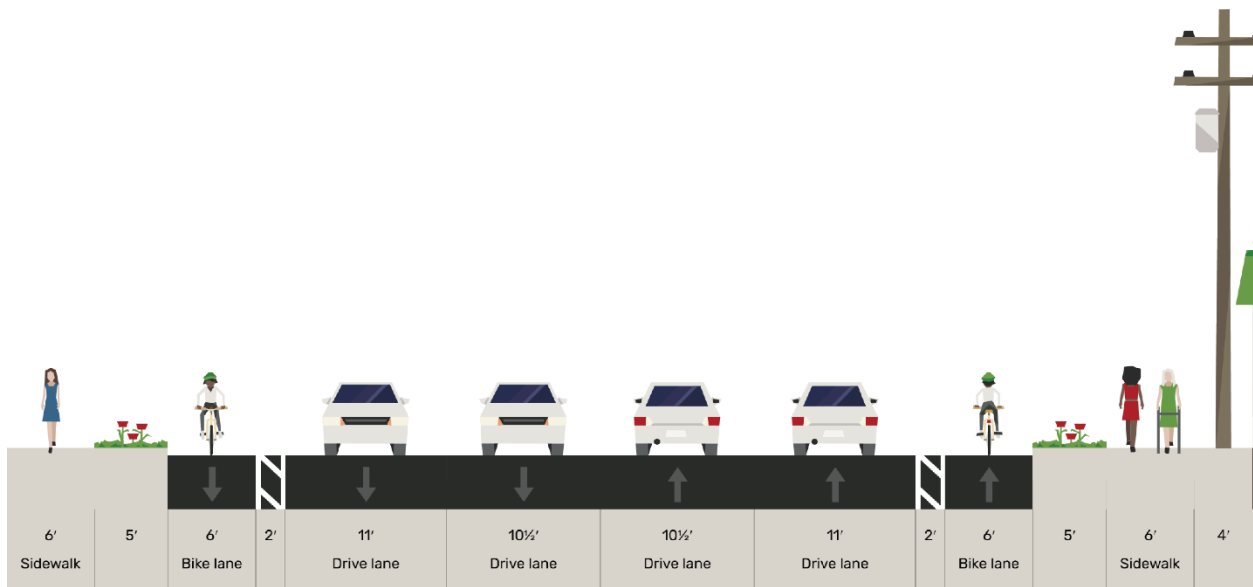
Draft Concept Alt C Typical Cross-section North of Central Expressway
